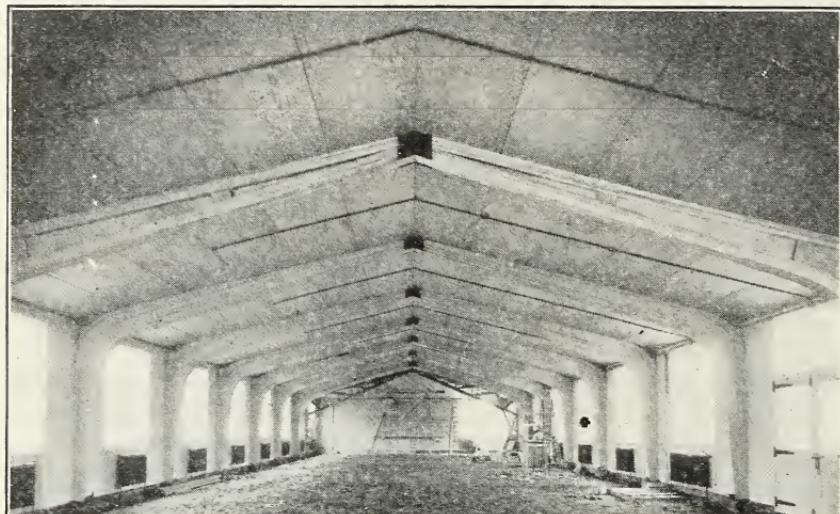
A well-lighted modern shop with plywood roof supported by laminated wooden arches that eliminate the need for columns.
